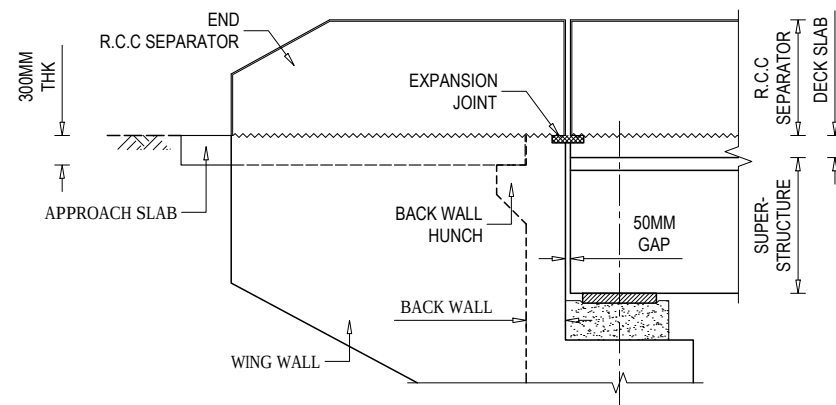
DETAIL ELEVATION VIEW AT R.C.C SEPARATOR
